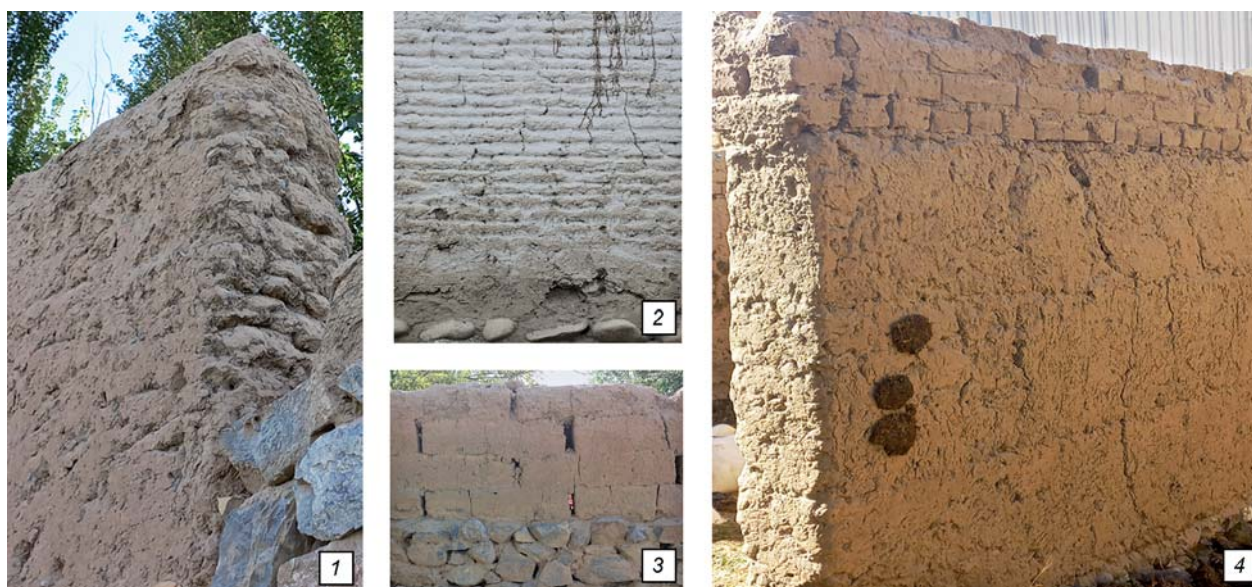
Walls made of *pakhsa*, erected in different ways. Tajikistan. Photo by N. Petrova.
